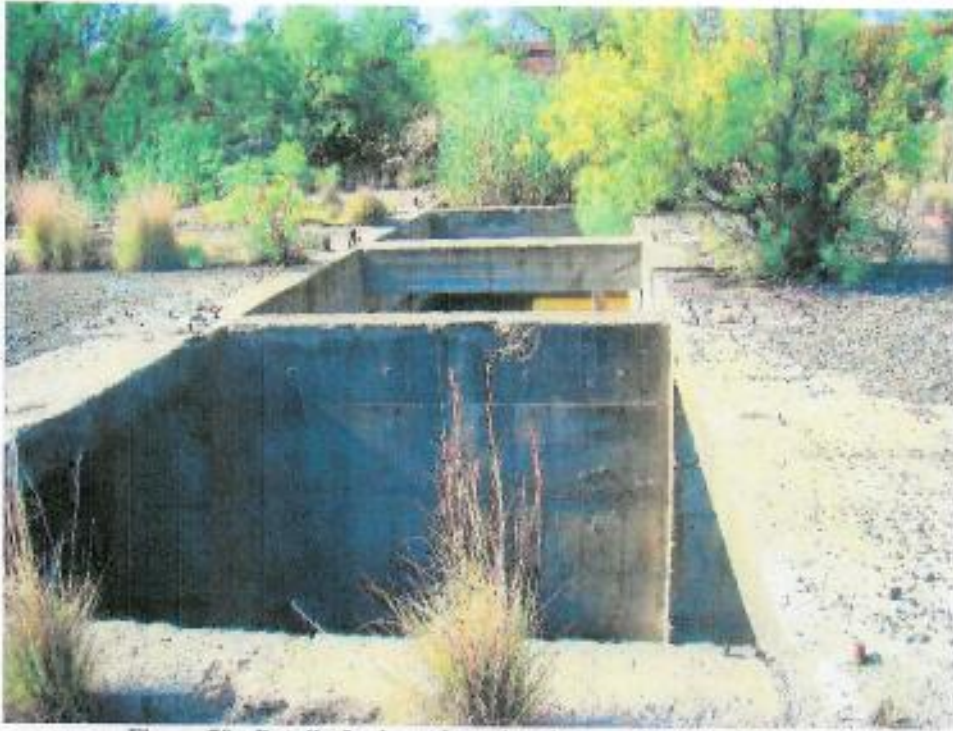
Detail of above-ground structures at Washing Plant (3)
